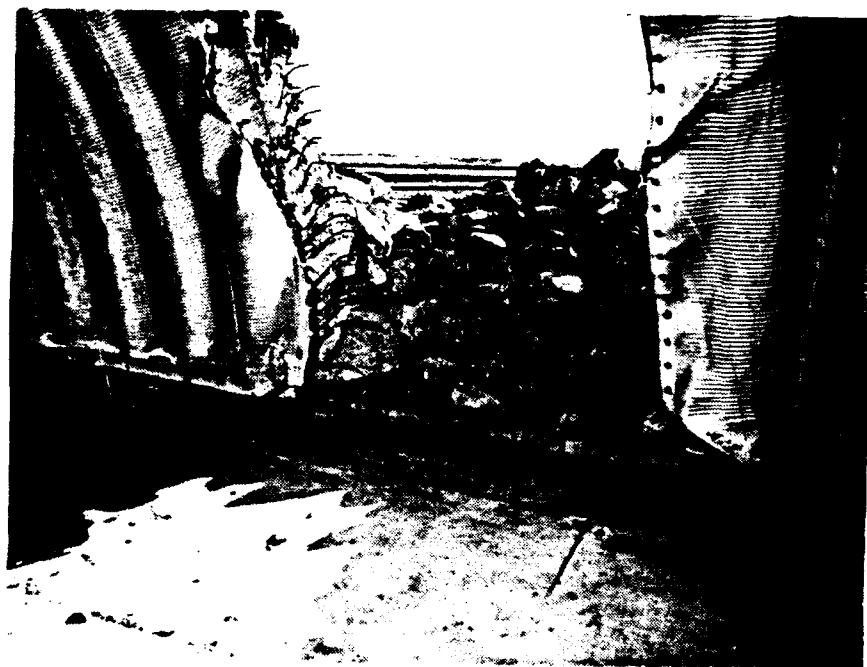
Broken dowel bars in arch foundation, PAS-2.
